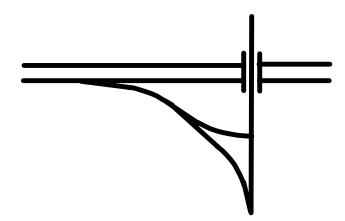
Combined Diagonal and Outer Connection Ramp Design.
